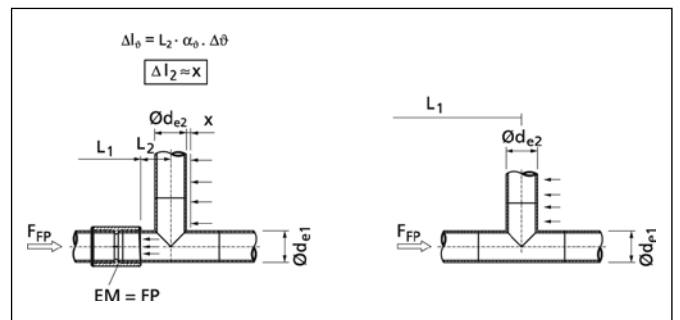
Shear and fixed point forces on tees and 45° branches
